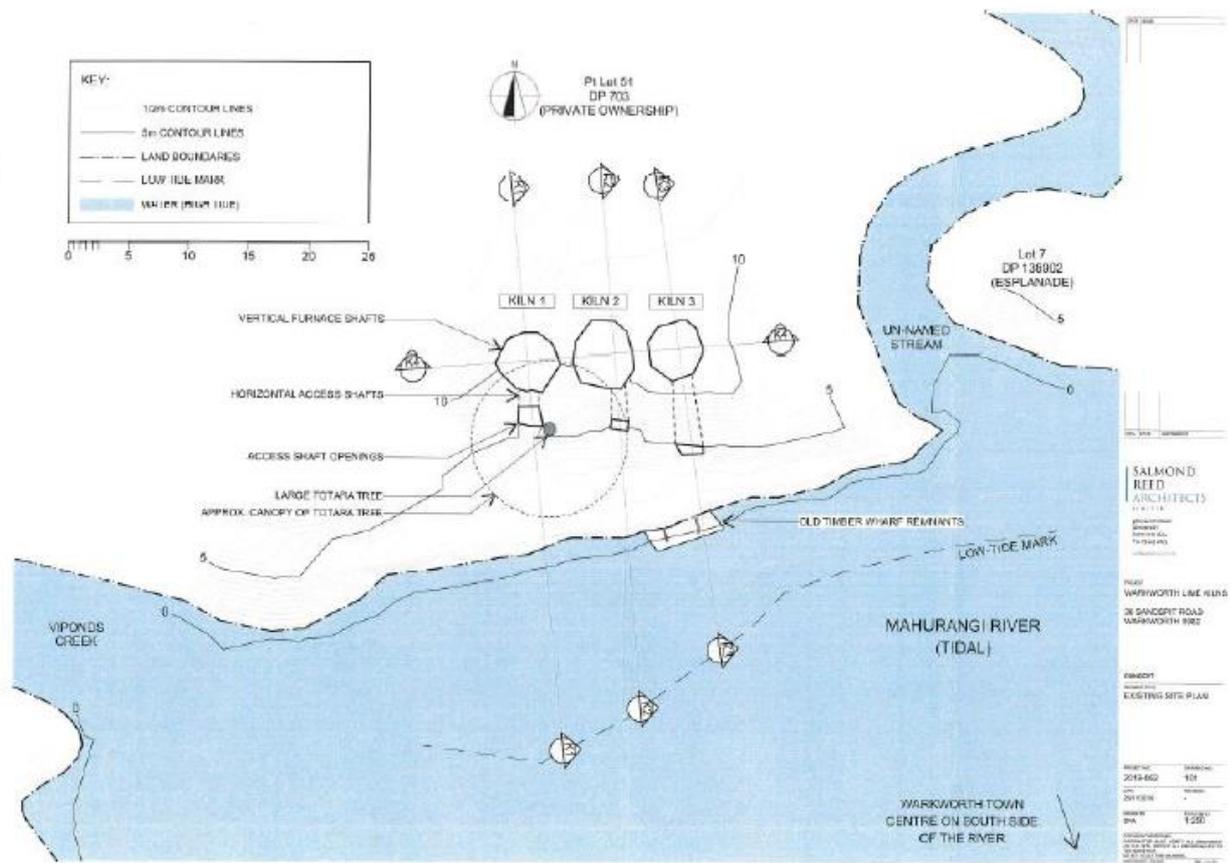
Existing site plan of the kilns (Salmond Reed 2020)
